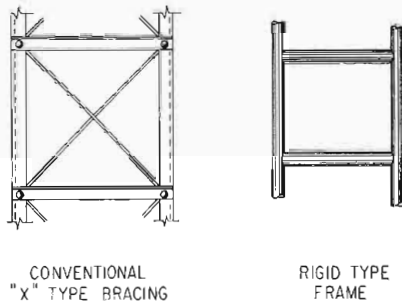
Conventional X-type and rigid-frame bracing.
